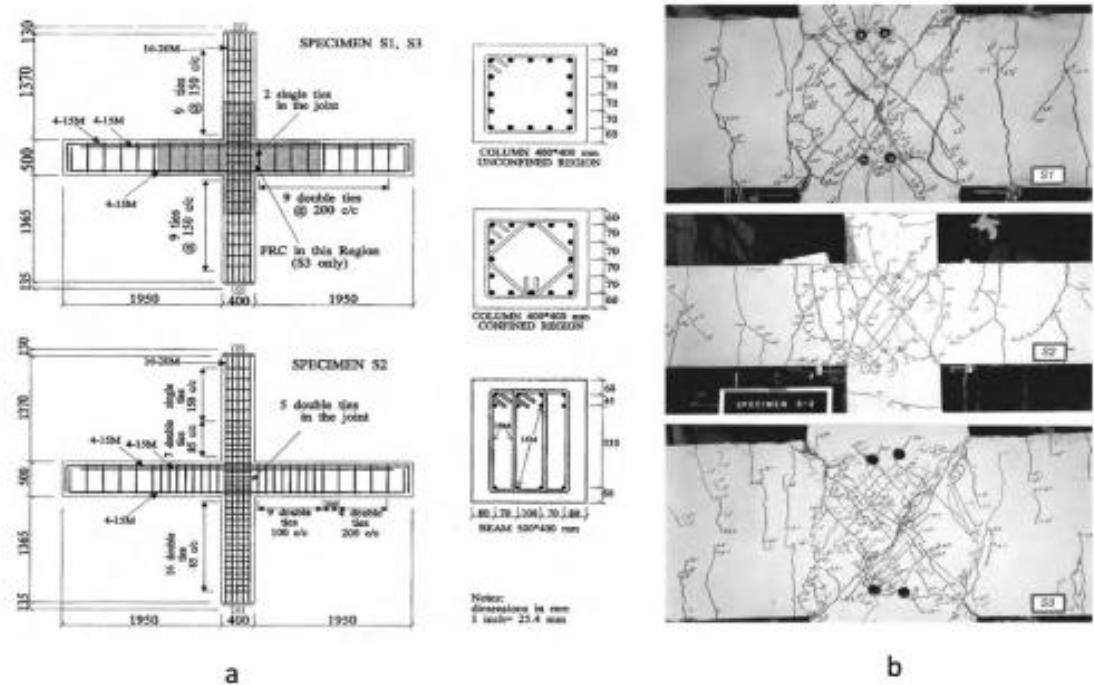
a) Details of the tested specimens, b) crack pattern of examined specimens [44].
